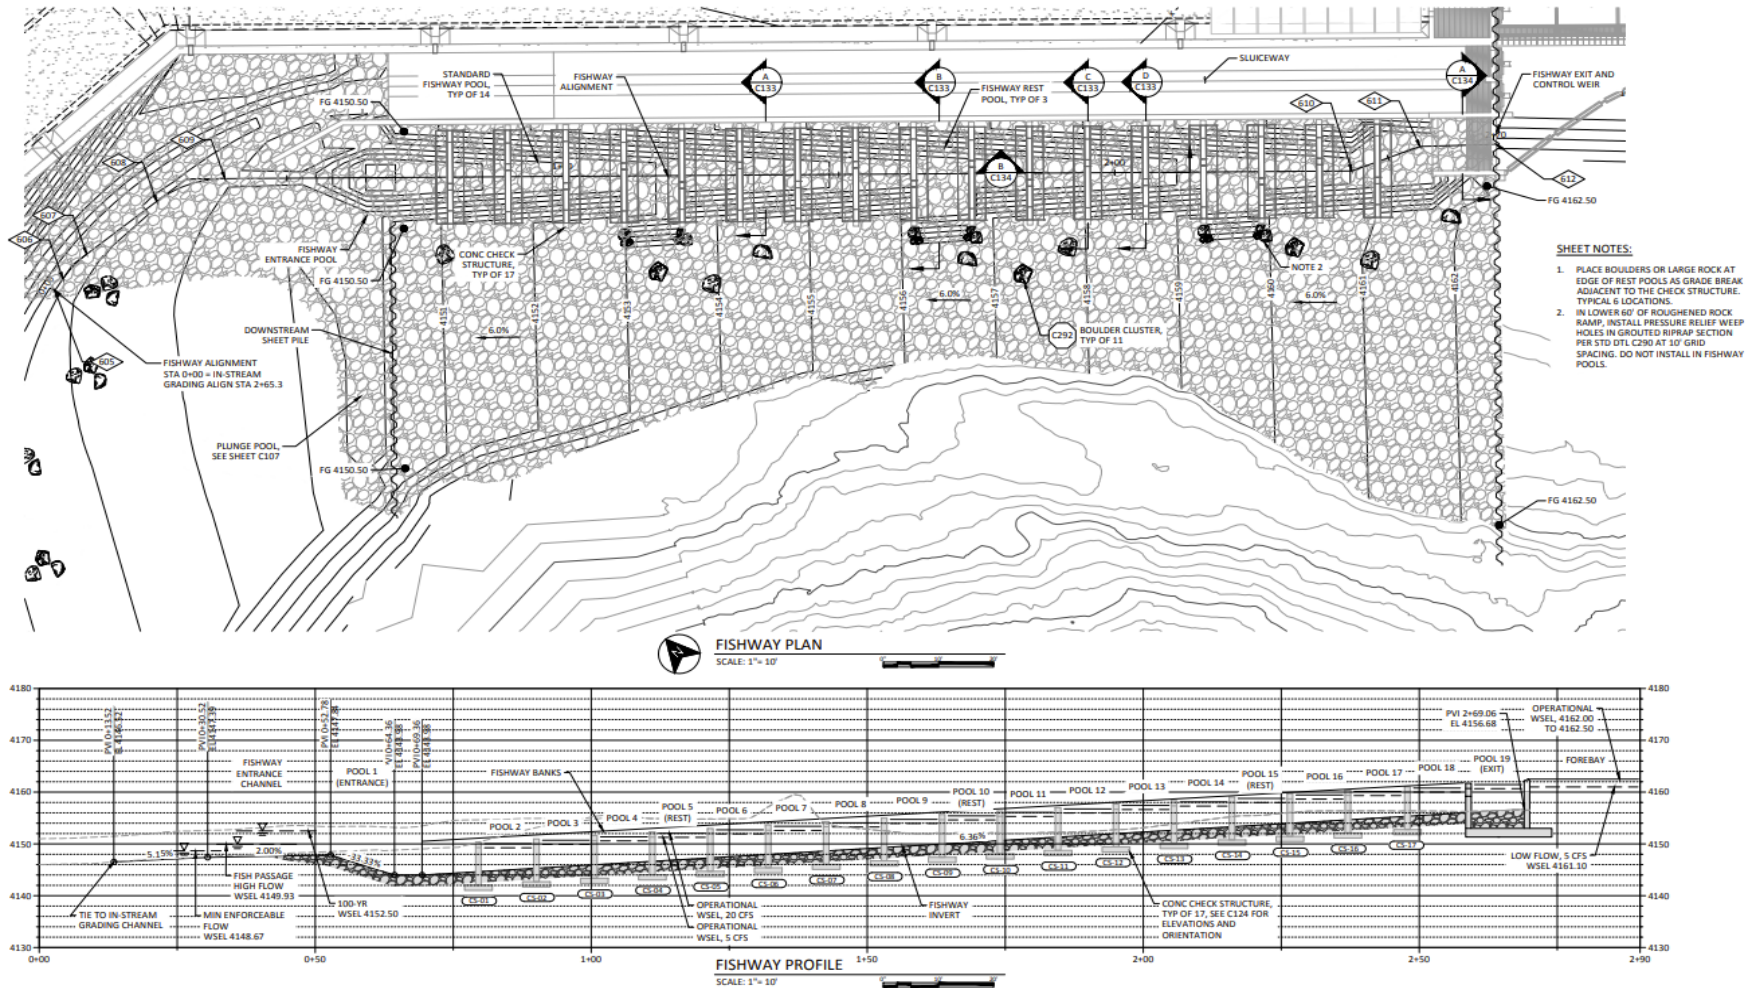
Overview of grouted rock ramp, fishway, and sluiceway
